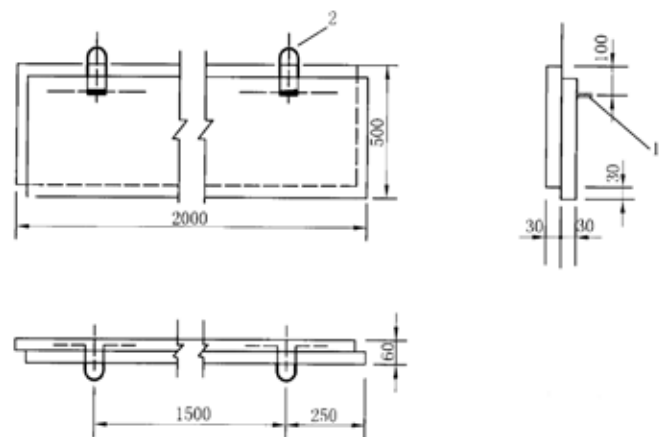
Typical structure of prefabricated reinforcement concrete slab. 1: fixed ring; 2: hanging ring. Unit: mm
